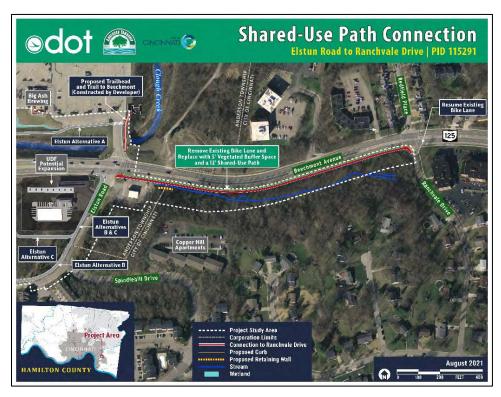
Ranchvale Connection (PID 115291) Build Alternative
